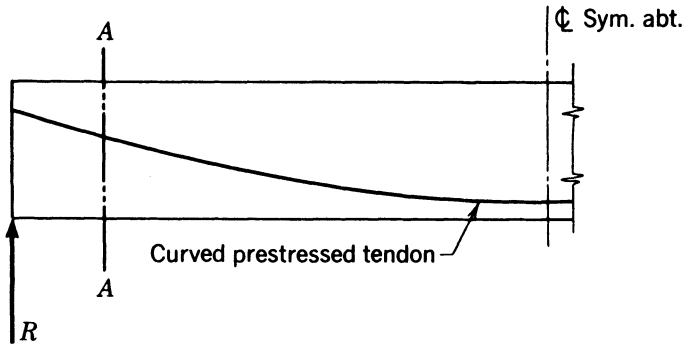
Half-elevation of a simple beam with curved tendon.
